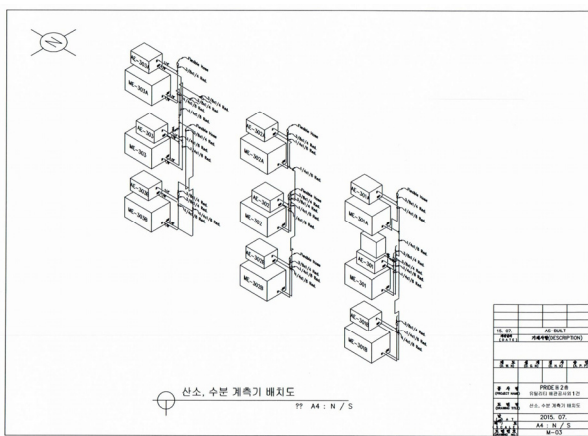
Oxygen & Moisture measuring instrument layout drawing.
